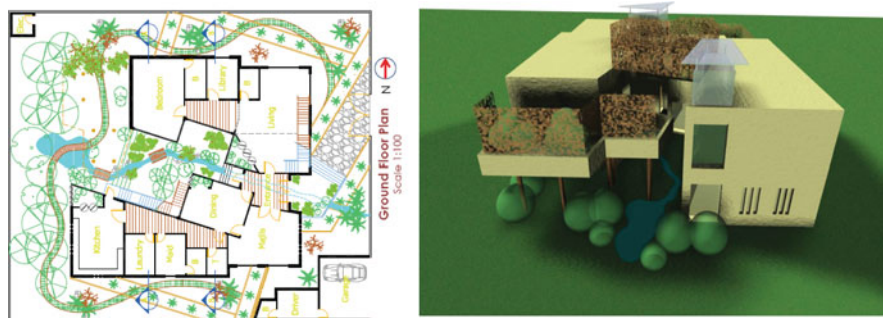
Site showing landscape elements (*left*) and 3D view (*right*) of the Eco-House
